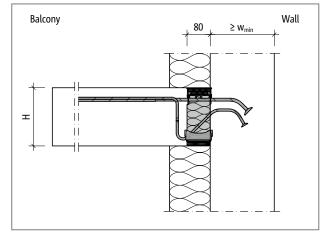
Schöck Isokorb® T type K-O: Wall connection downwards with external insulation
